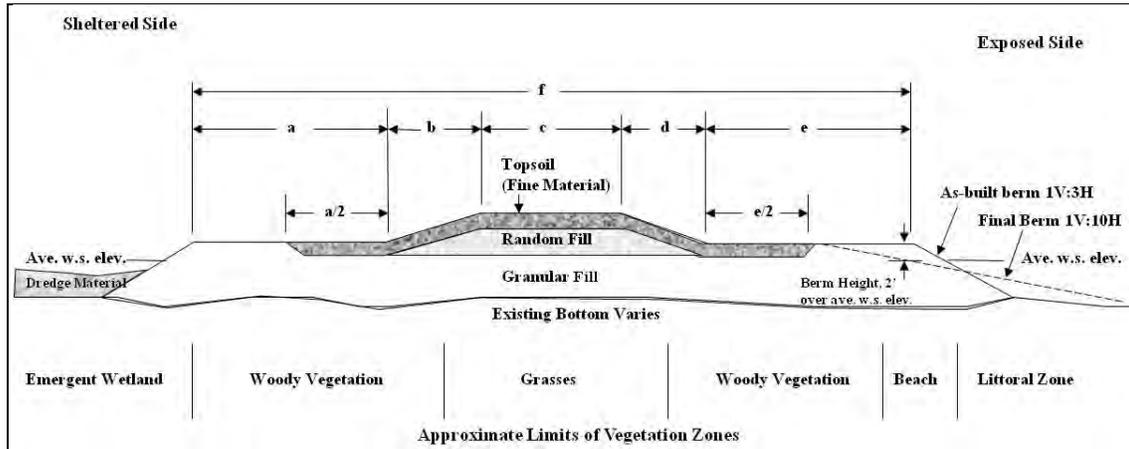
Island Cross Sections Typically Used for Island Construction
